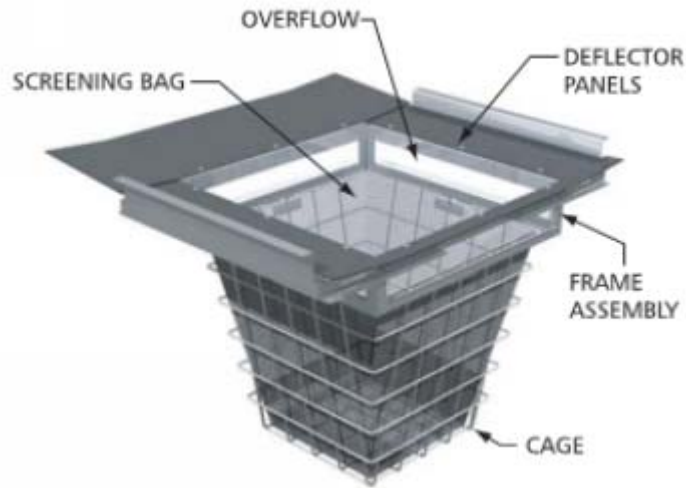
EnviroPod Pit Inlet Trap (Source: Stormwater 360)
